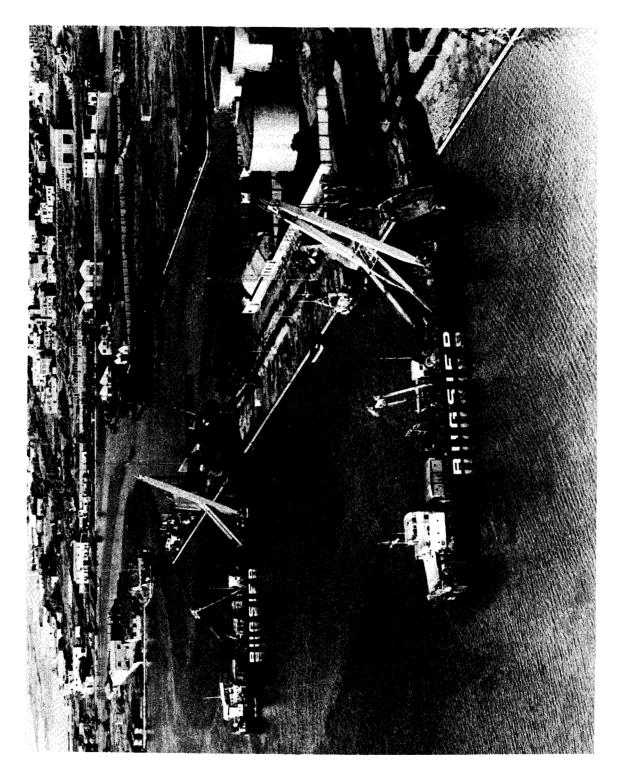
THOR Lifting Section 2 of MECCA
